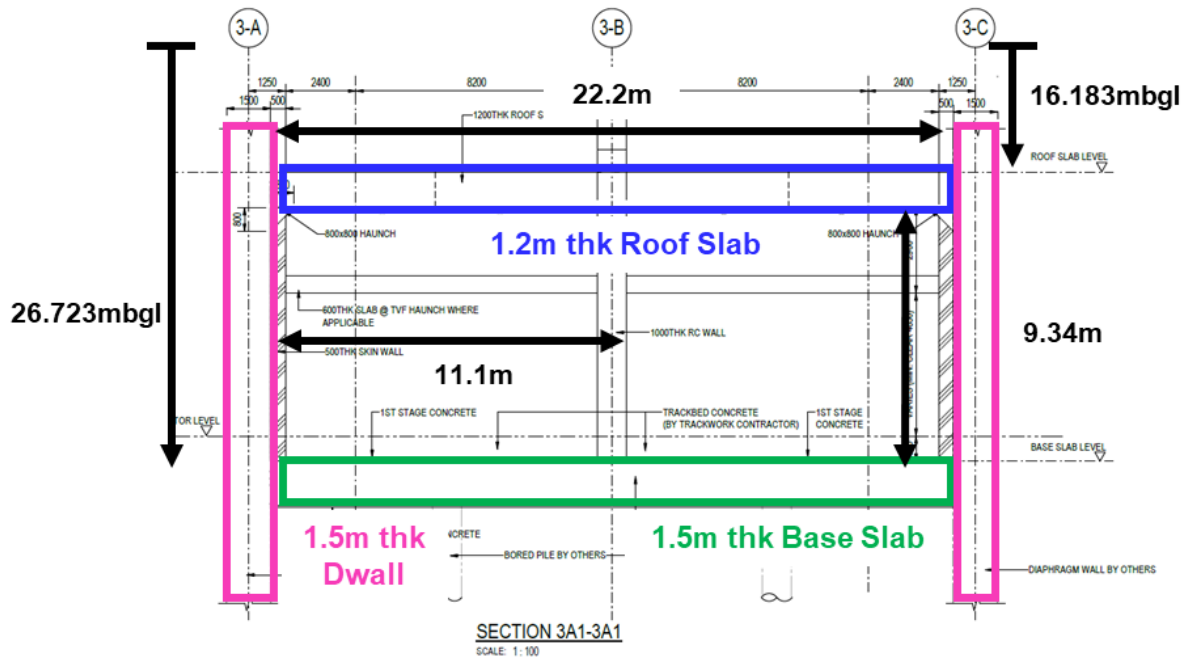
Typical cross section of C717 Cut-and-Cover Crossover Tunnel
